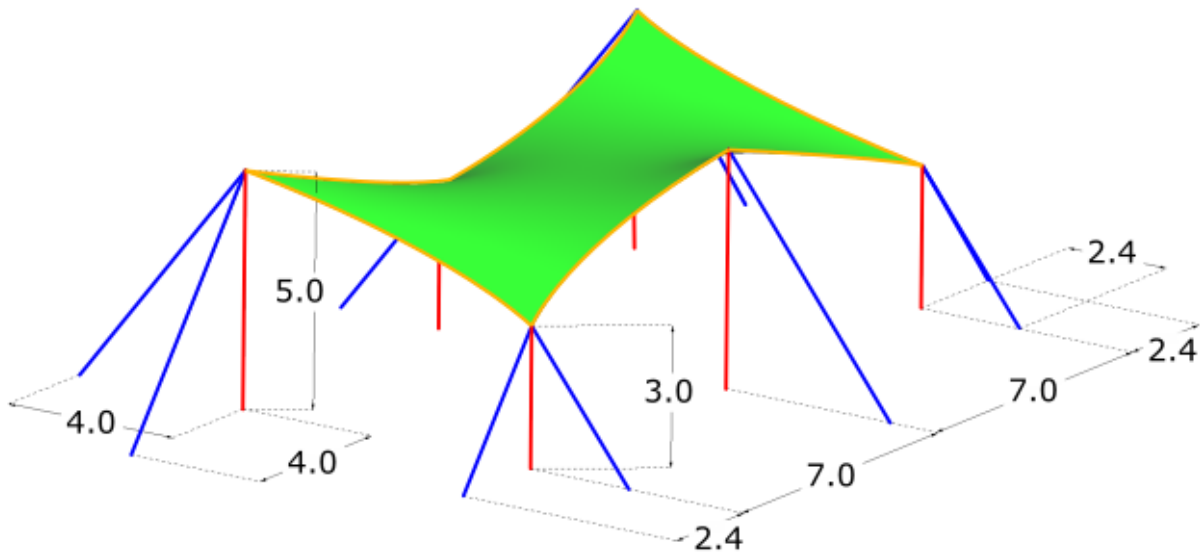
Double-hyper 3D view. Dimensions in meters
